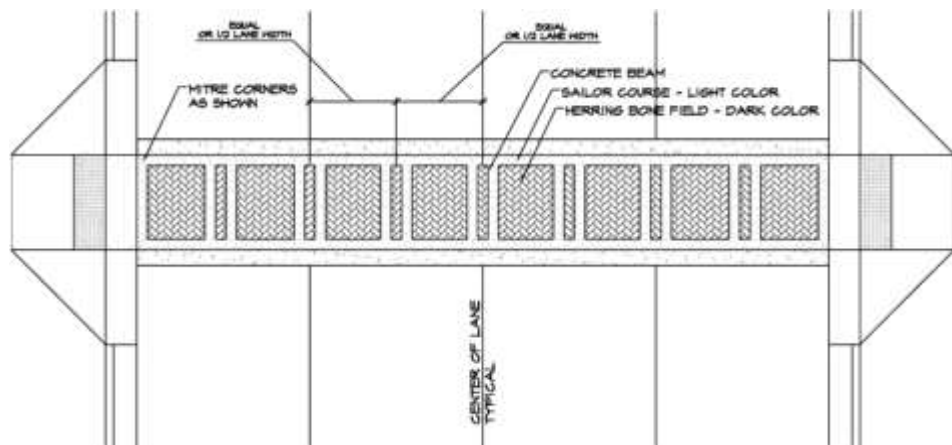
Standard Plan Showing Paving Design for Typical Crosswalk (Not Raised)
